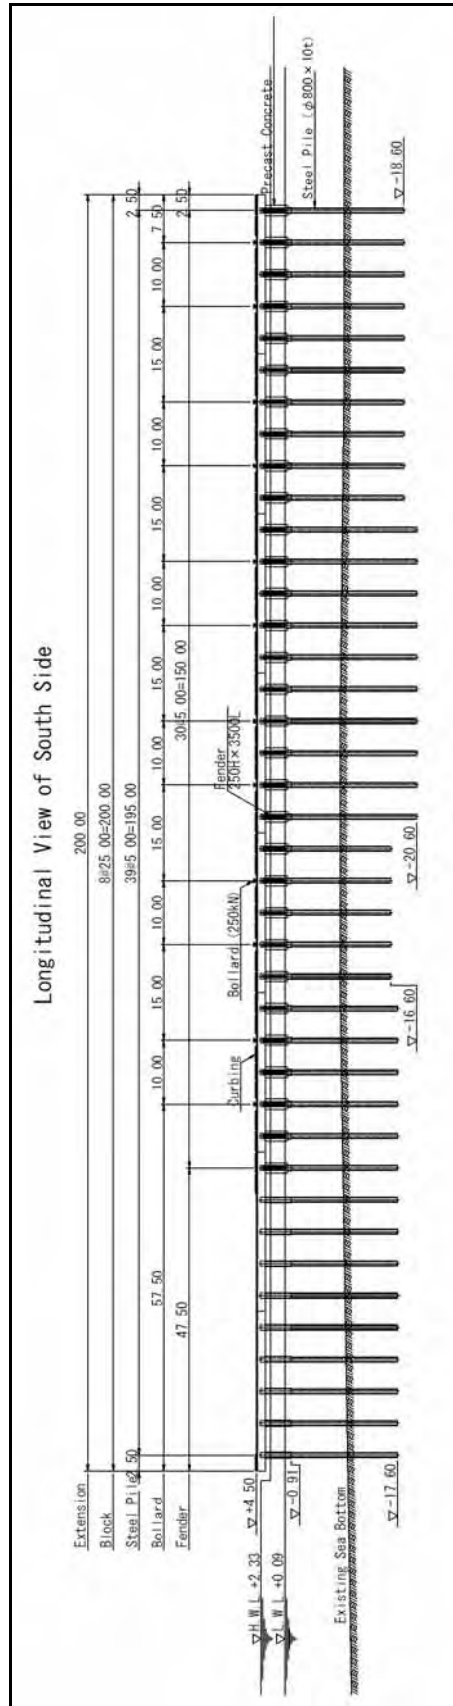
Longitudinal View of South Side of Pier
